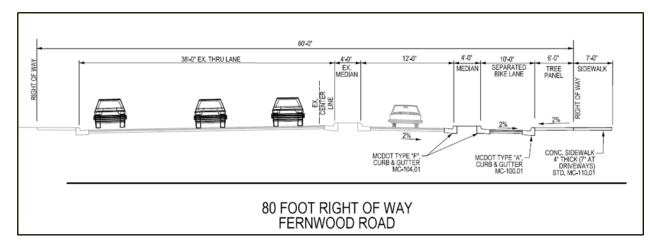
Approved Fernwood Road Section along Marketing Center Frontage (from Rockledge Drive to Rock Spring Drive)
